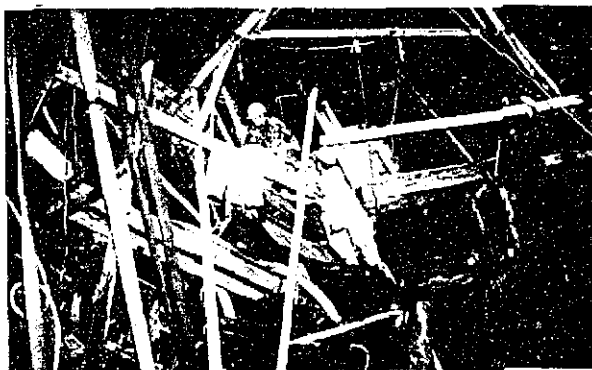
Aeration slot forms installed on the 55° sloping section of the spillway tunnel. Workmen are changing location of the concrete pump discharge line in the forms. Access cart can be seen in the photograph. Note unwatering hoses and difficult formwork and bracing. Photo P459-D-68572
